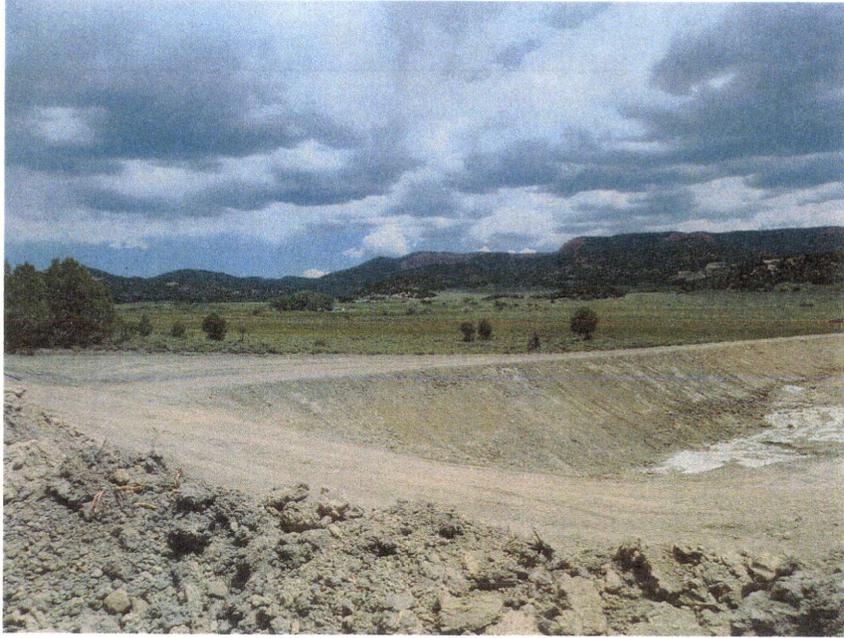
A view of Sink Valley with Pond #4 in the lower right hand corner
